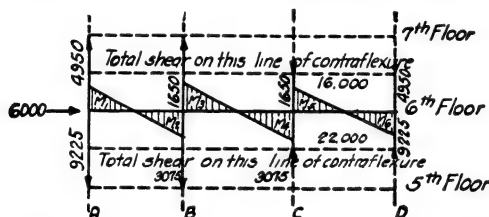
Column shears and girder moments at sixth floor, calculated by Method I.
